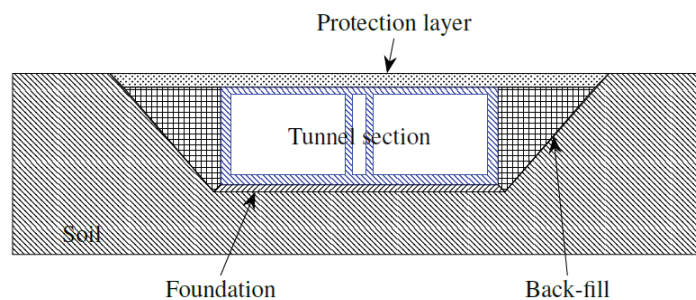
Tunnel cross-section in the final situation, covered and on the foundation
